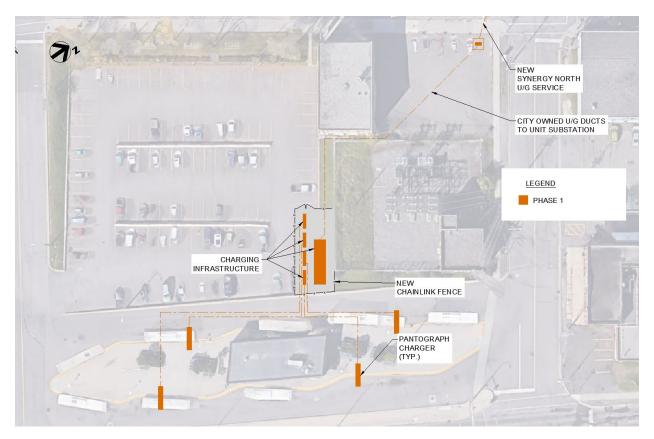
Conceptual Site Layout - Waterfront Transit Hub
